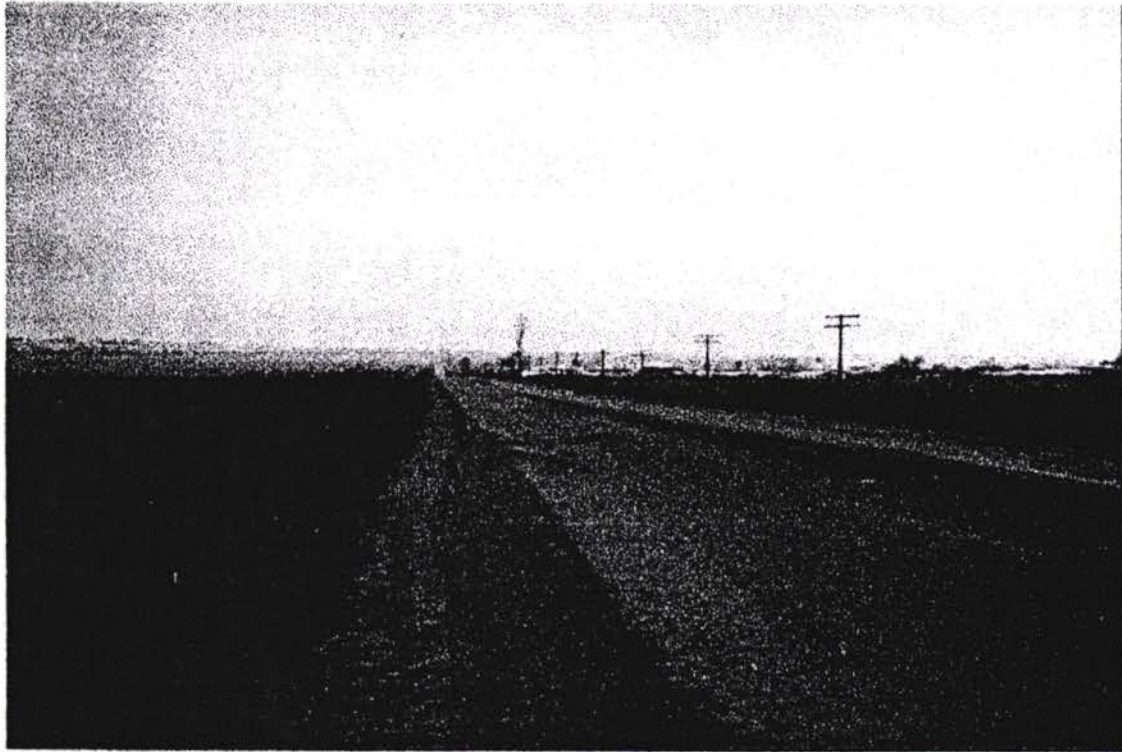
Typical road view between Ganja bypass- Shamkir (at 120 km from border)
